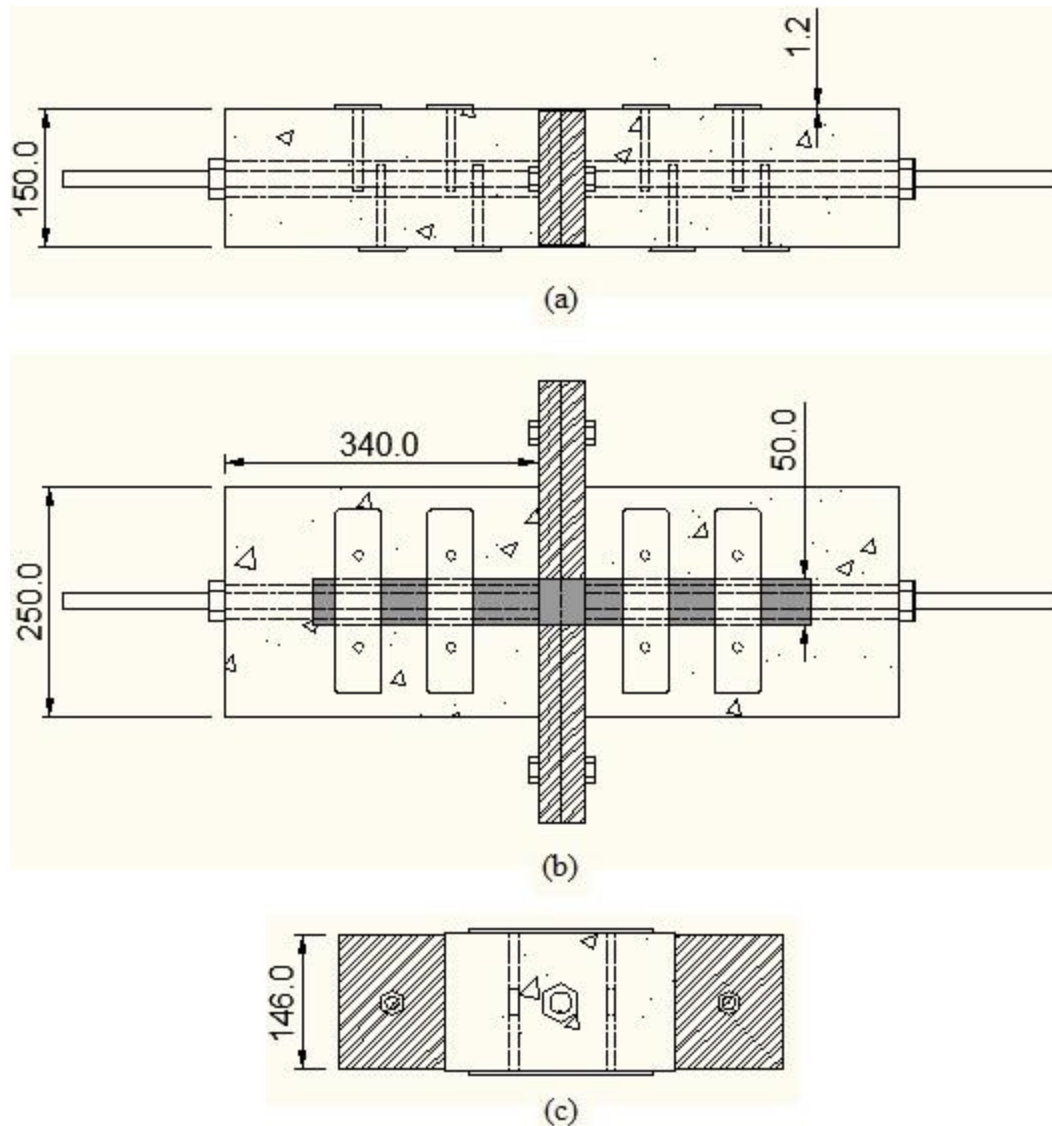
Typical specimen with two anchors per face (a) Elevation view, (b) Top view and (c) End view
